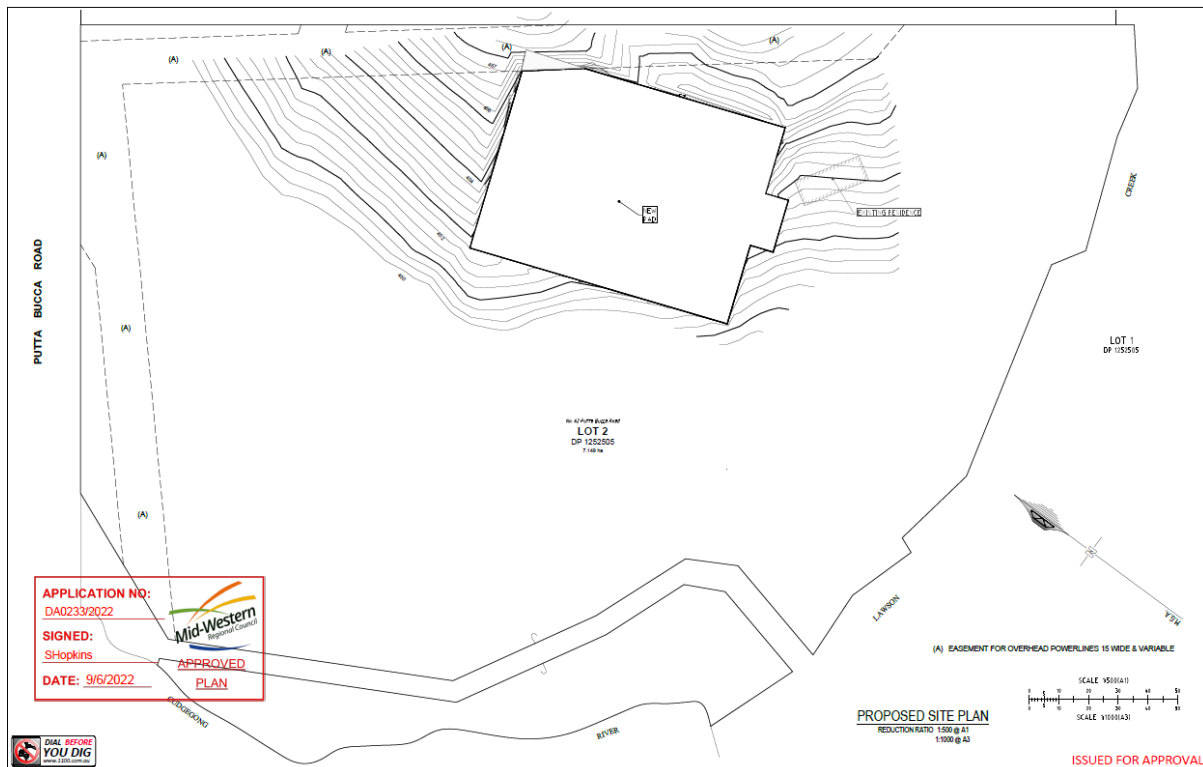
Approved plan under DA0233/2022 for earthworks and retaining wall
